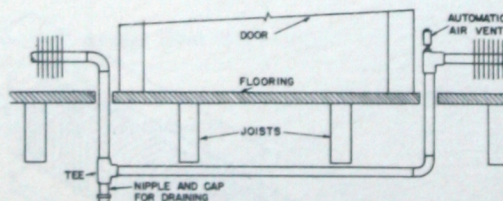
Typical Door Loop or Expansion Loop Detail
